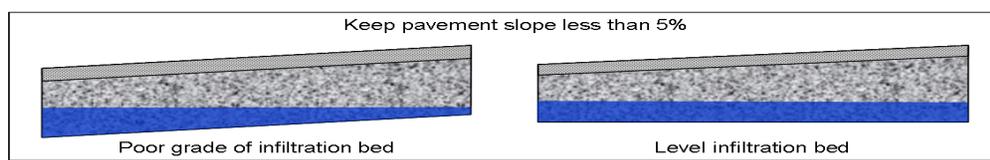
Level infiltration beds and limited pavement slope maximizes stormwater treatment and storage.
